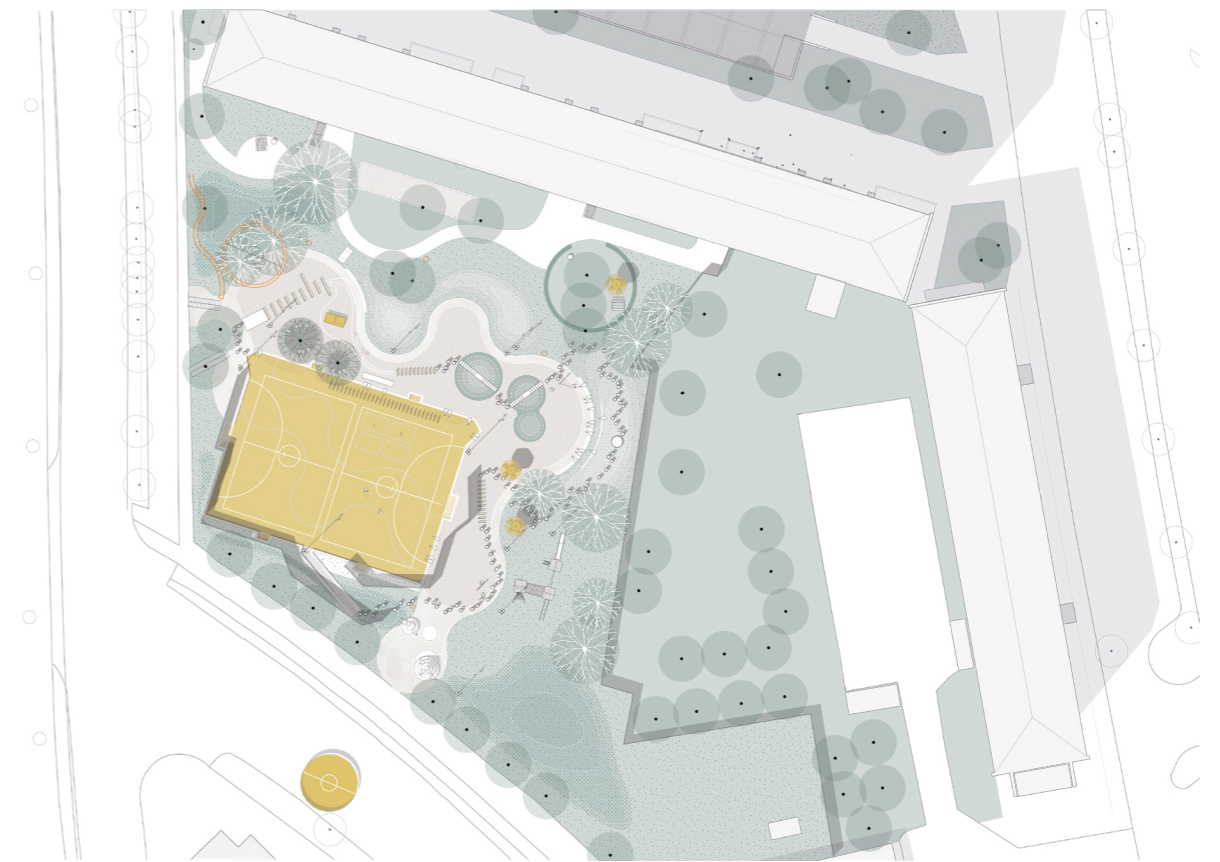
Lundtoftegade South-courtyard Plan Concrete Path 1:250, by MASU Planning
